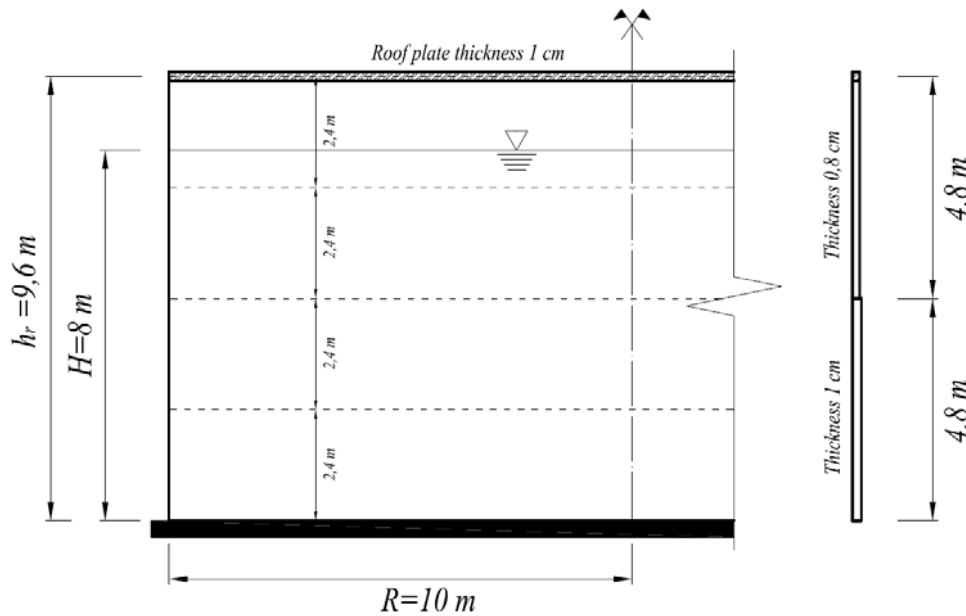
Steel tank fully anchored to a concrete mat foundation.
